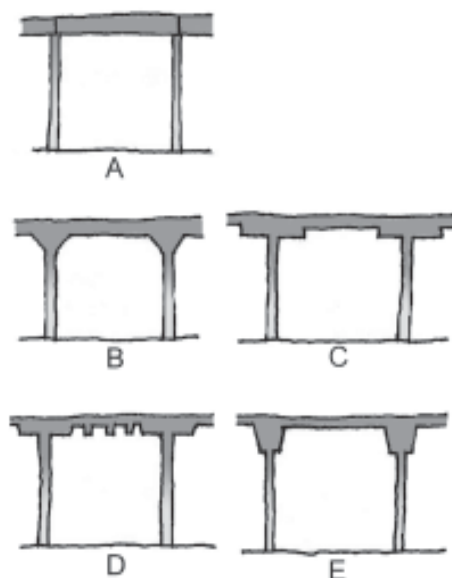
Image A depicts a typical, simple span. Images B, C, D, and E are examples of concrete framing that improves beam-column connections, by making them more rigid,
